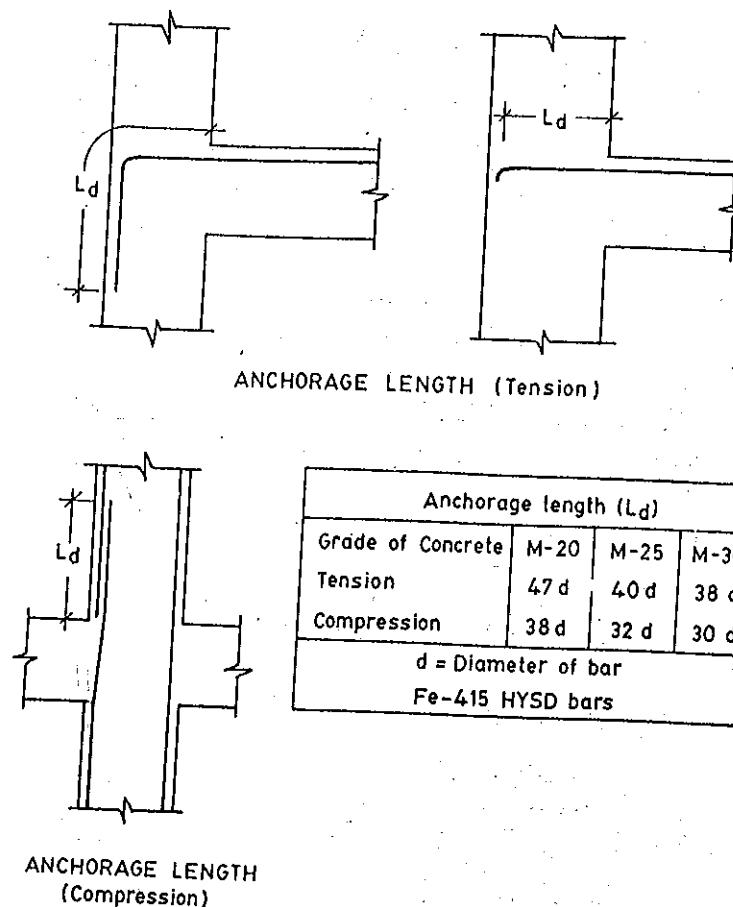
Anchorage Length of Bars (IS 456-2000)
